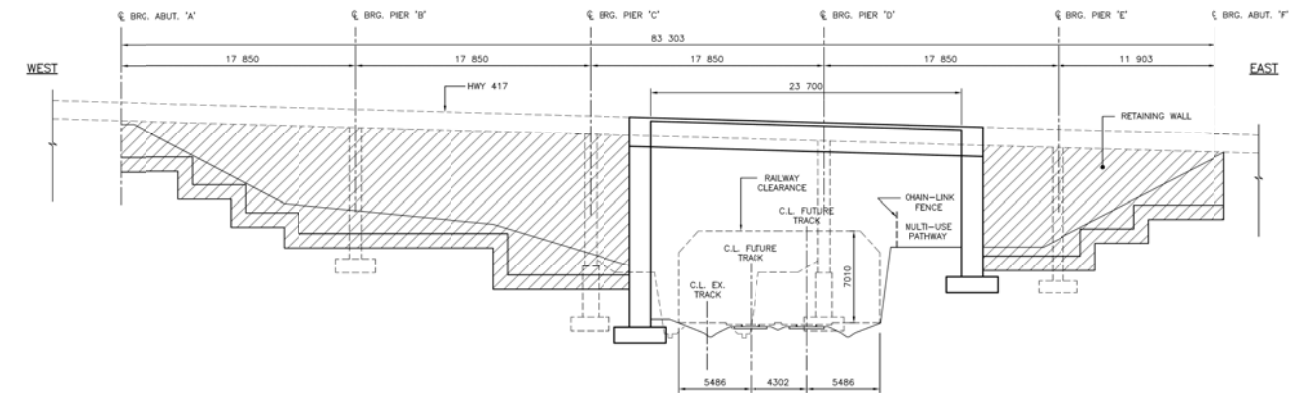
Alternative H – Single Span Deck Structure Installed by Jack-And-Slide
